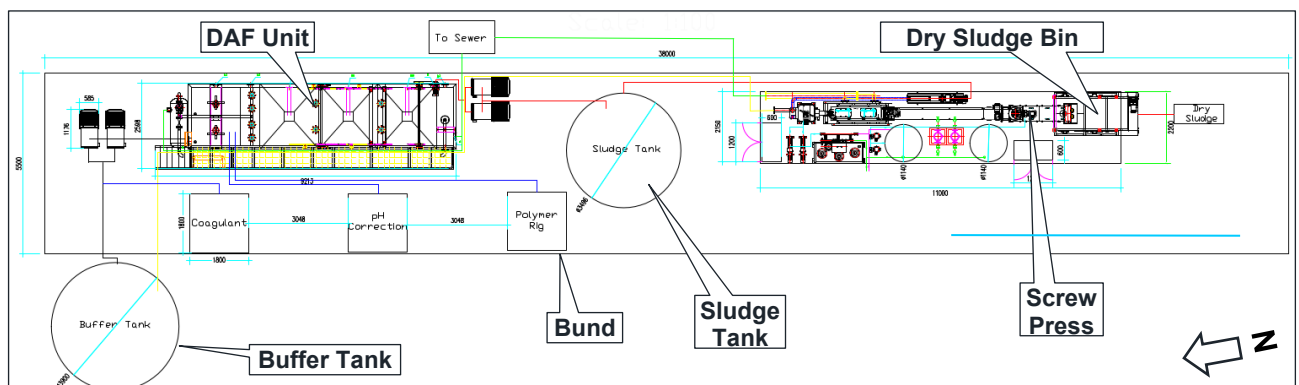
Preliminary Treatment Plant Layout (Extract from project design drawings)
